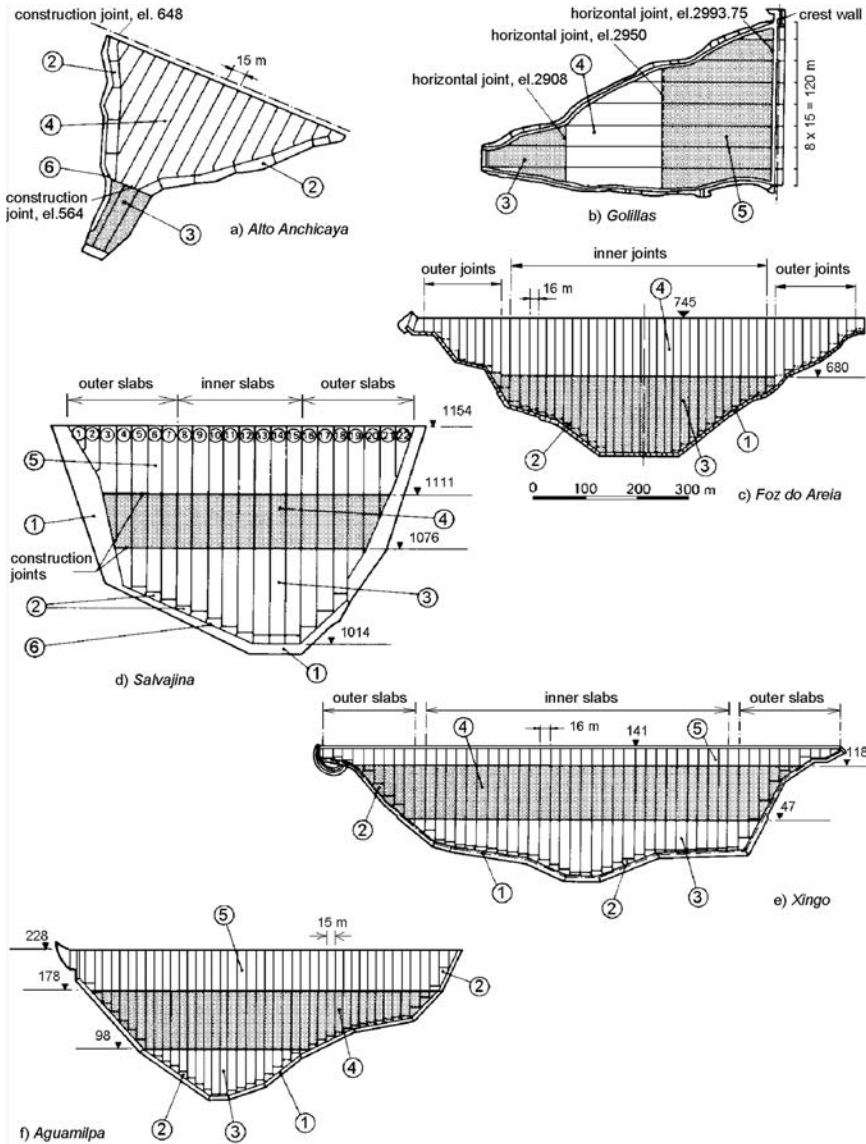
Development of stage-by-stage construction of reinforced concrete facings. (1) Plinth; (2) starter slabs; (3) first stage; (4) second stage; (5) third stage; (6) perimeter joint.
